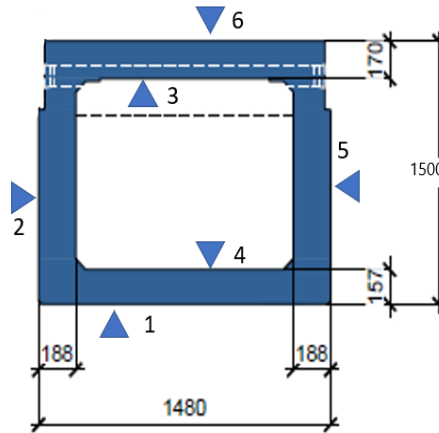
Surfaces of prefabricated beam. Source: Consolis Spanbeton [41]
